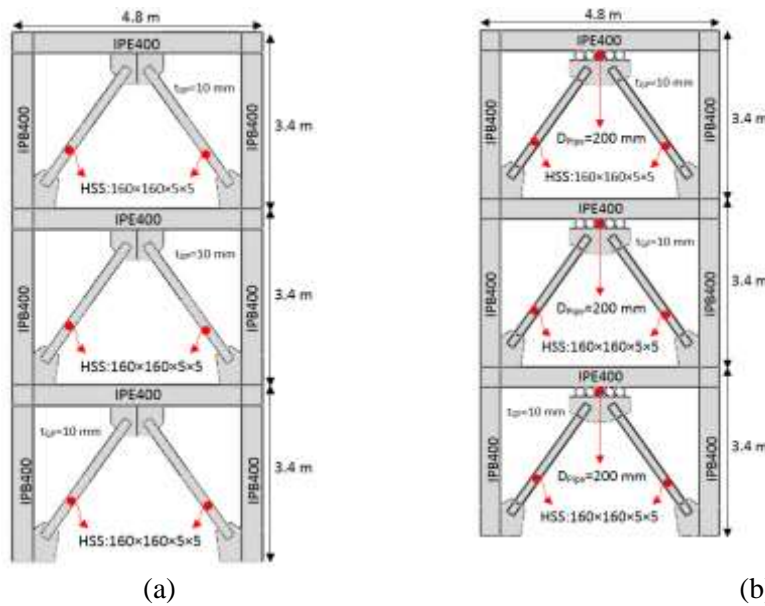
Type of FE models studied: (a) Chevron bracing frame, (b) Chevron bracing equipped with multi-pipe damper.
